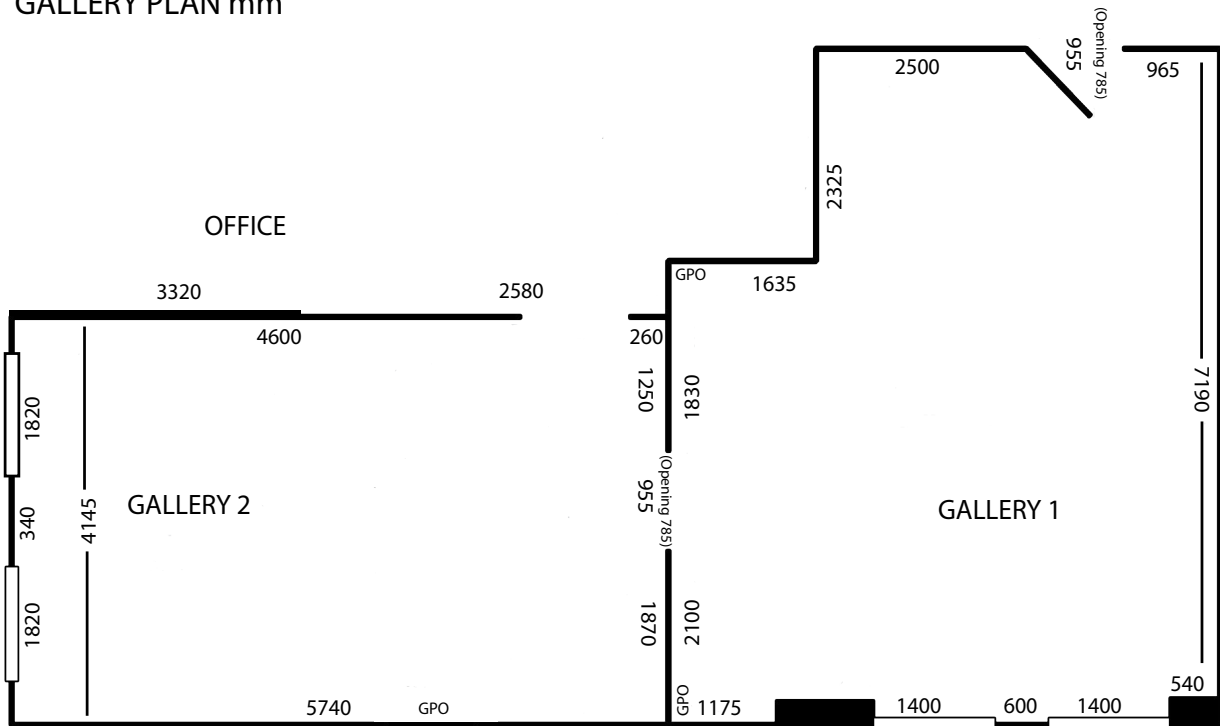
Exhibition space is 25 square metres with a ceiling height of 3.4 metres. The walls are MDF and the walls housing the windows are concrete. GALLERY TWO has south-west facing windows. The gallery floor is concrete.
